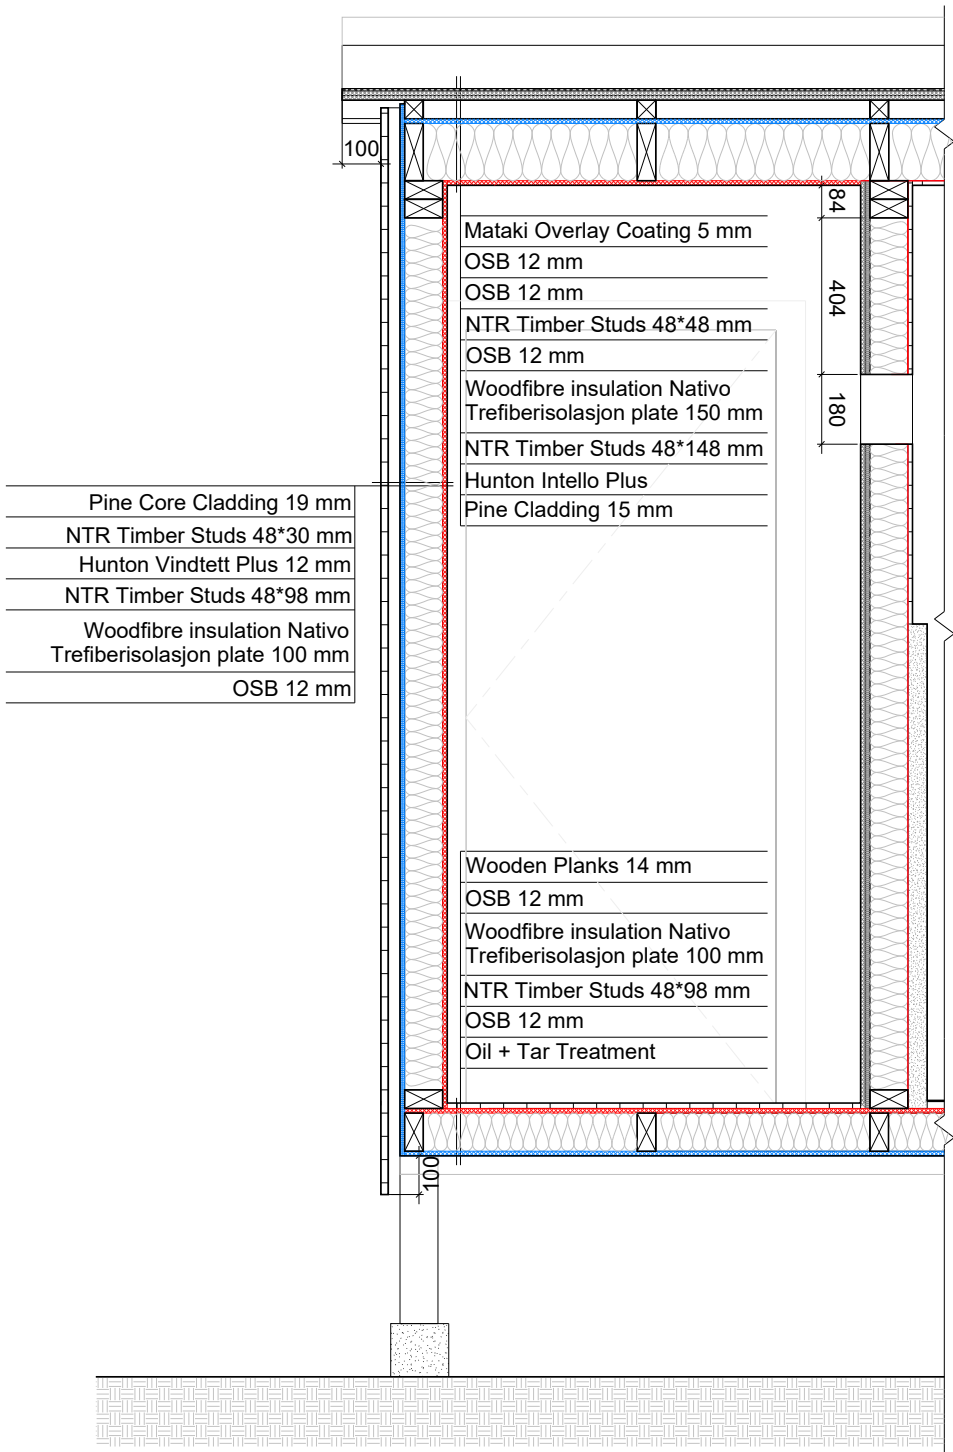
DETAIL OF SECTION B-B. SCALE 1:20
